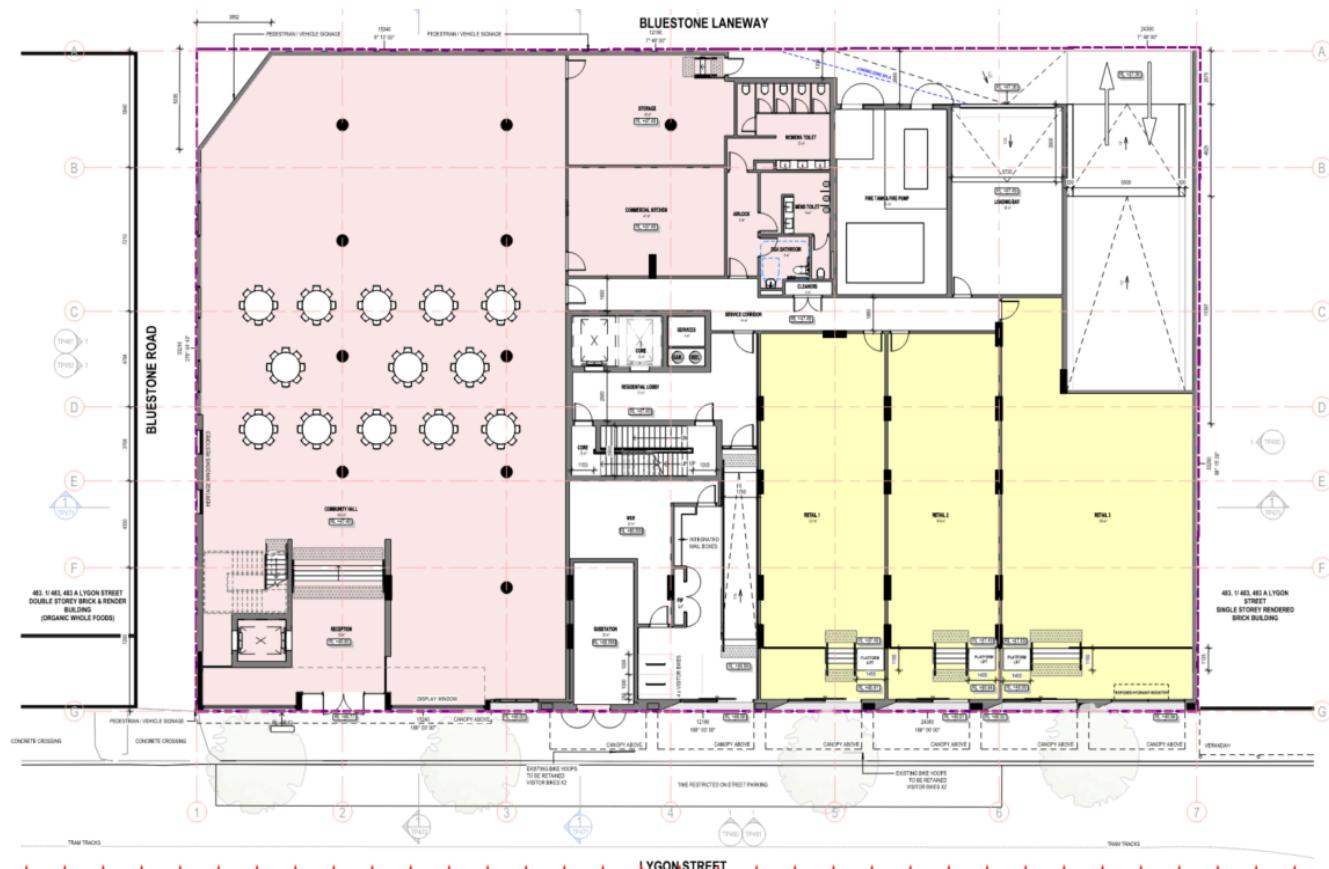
KUD - Proposed Ground Floor Plan - 87a Application' drawing set - TP303 REV E - 31.10.2025
